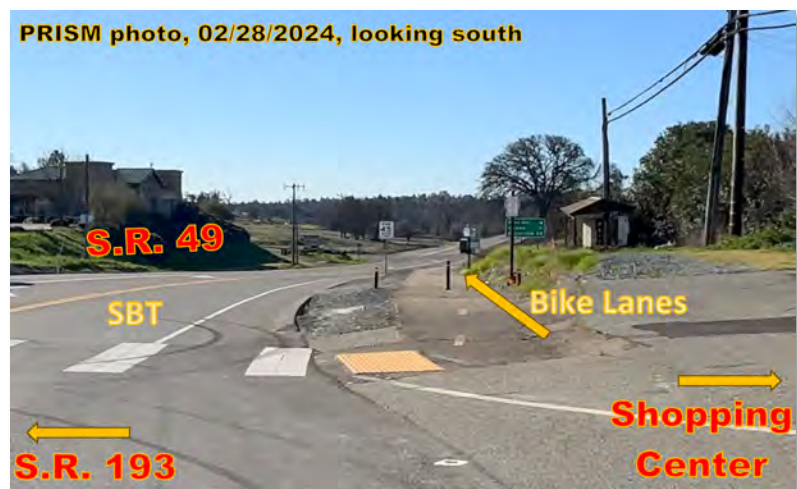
Intersection of SR 49 and SR 193 Existing Traffic Control and Striping
